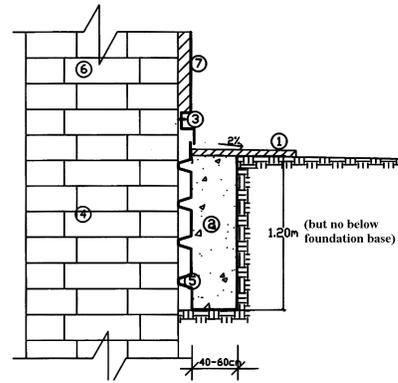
Detail for ventilating foundation at “Adormirea Maicii Domnului” church
